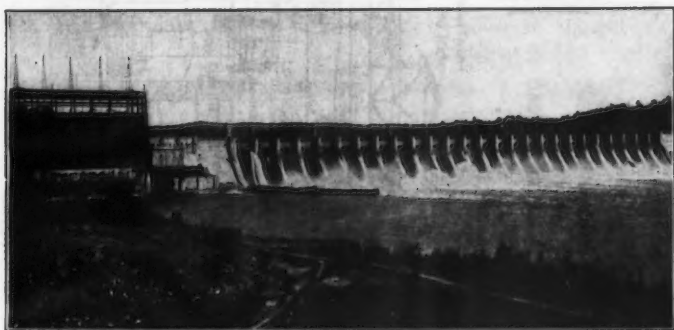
POWER-HOUSE UNDER CONSTRUCTION, BRICKWORK HAVING REACHED HIGH-TENSION FLOOR.
